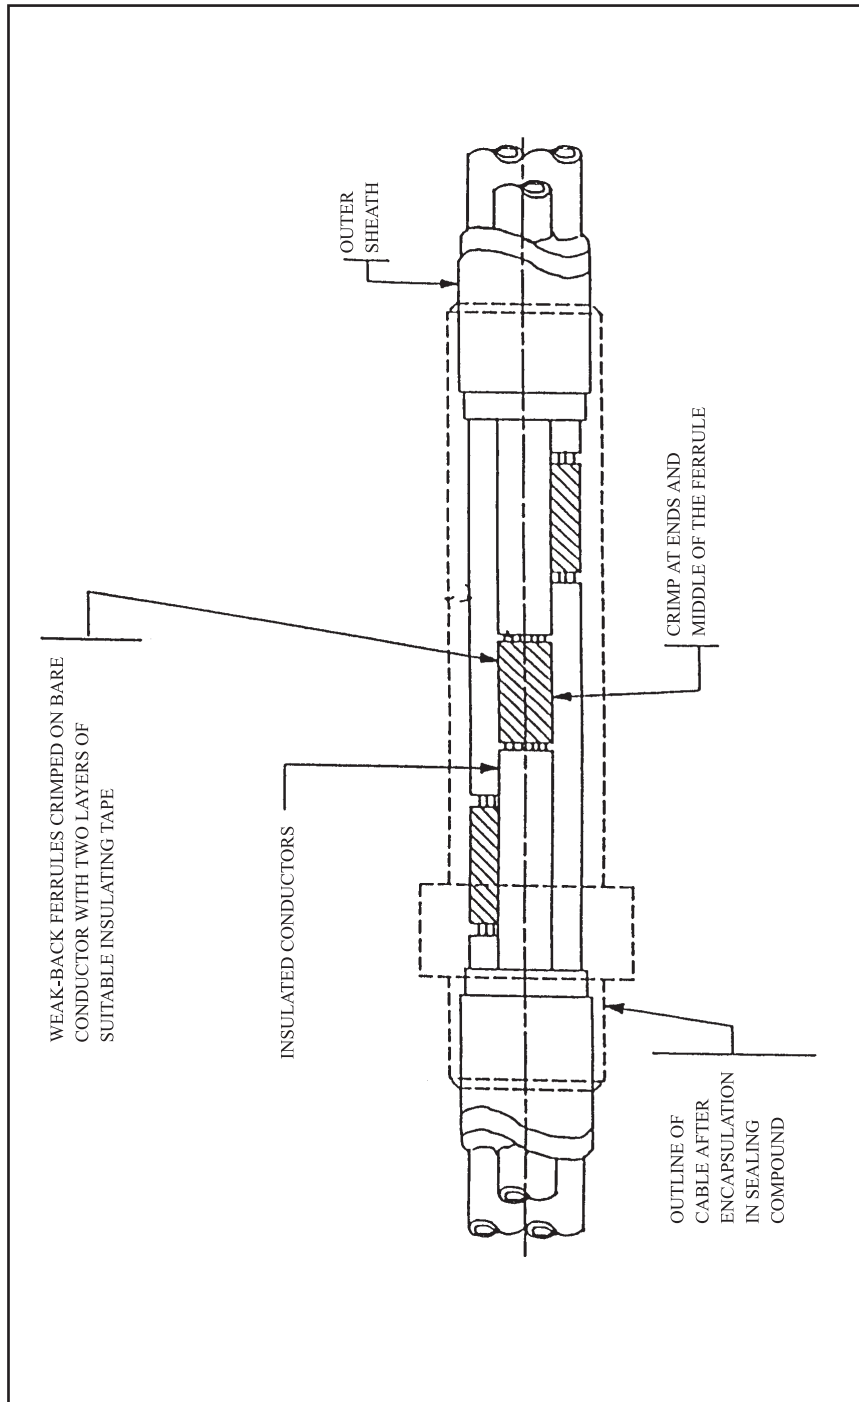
TYPICAL ARRANGEMENT OF STRAND SEALING OF POWER CABLES
